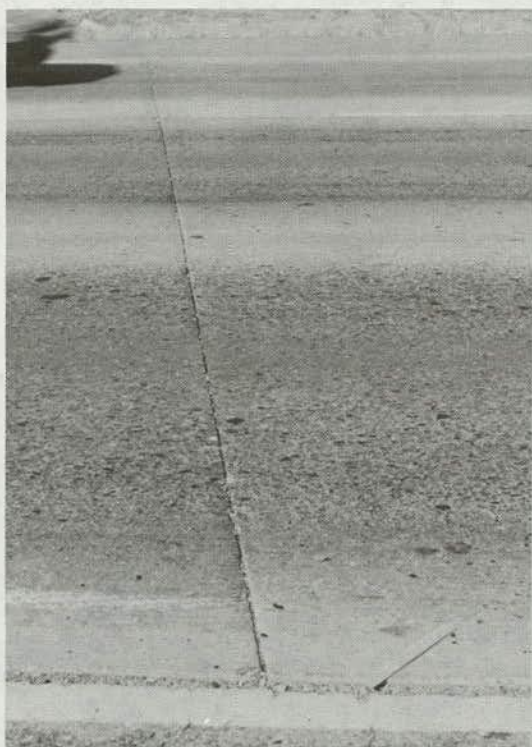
Studded Tire Damage. (Picture taken of a Jointed Plain Concrete Pavement.)
